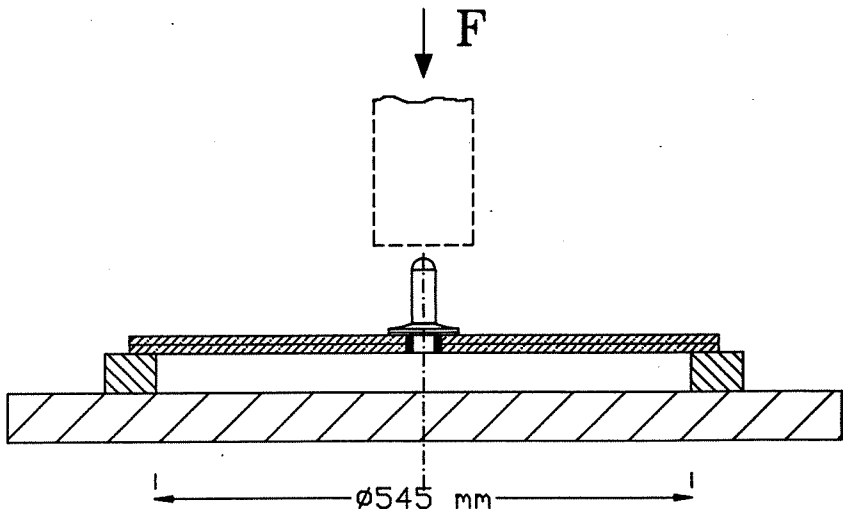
Test set-up for loading glass plates perpendicular to the surface
